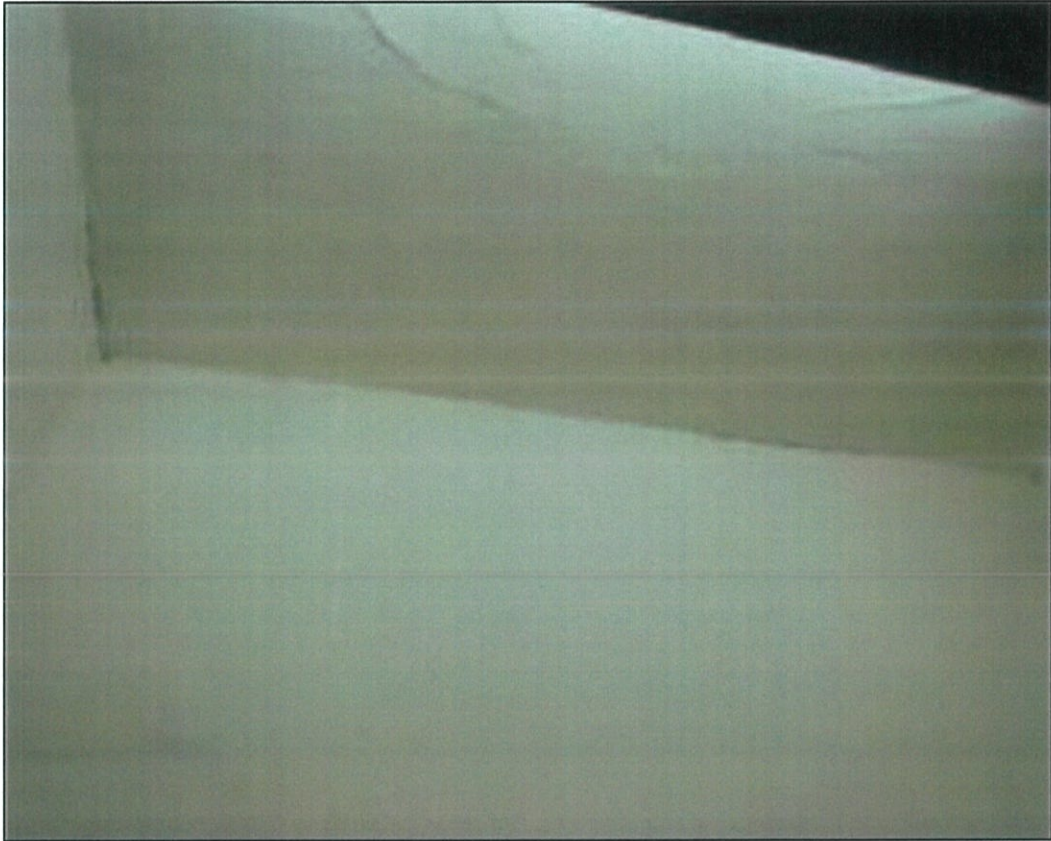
Ceiling Surface Rough and Painting Not Even.
